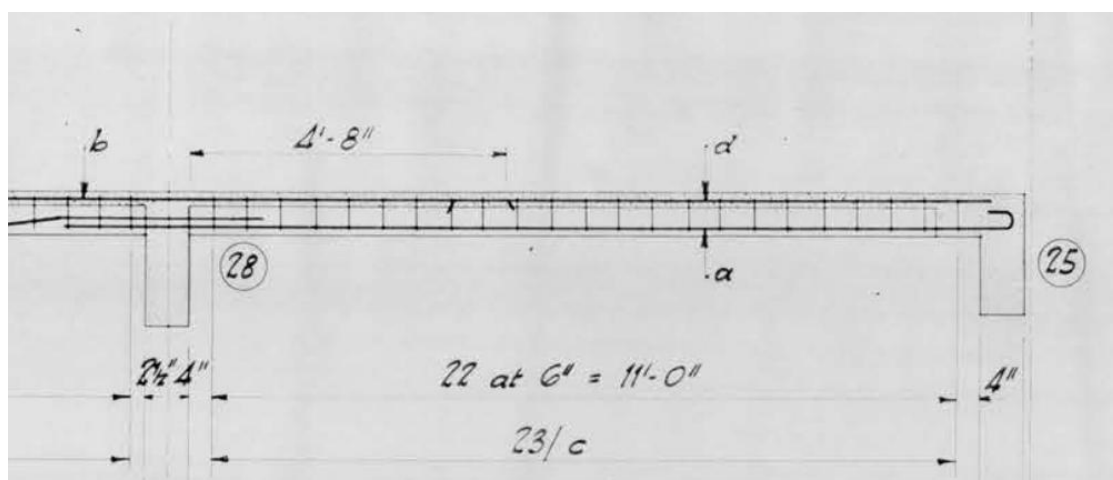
Typical Reinforcement Detailing of Ribbed Slab Edge Showing Curtailment of Reinforcement
